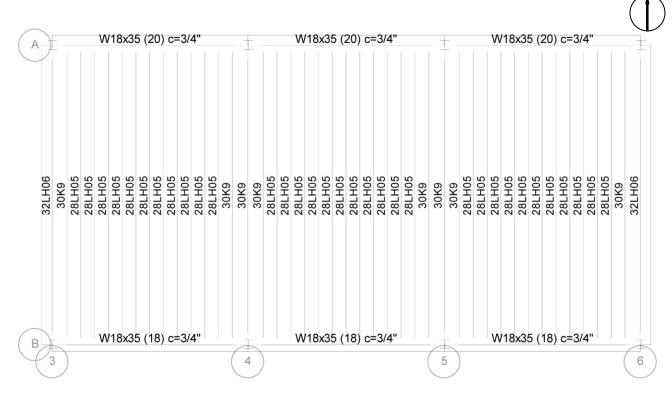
RAM design for open web steel joists with composite deck on beams.
